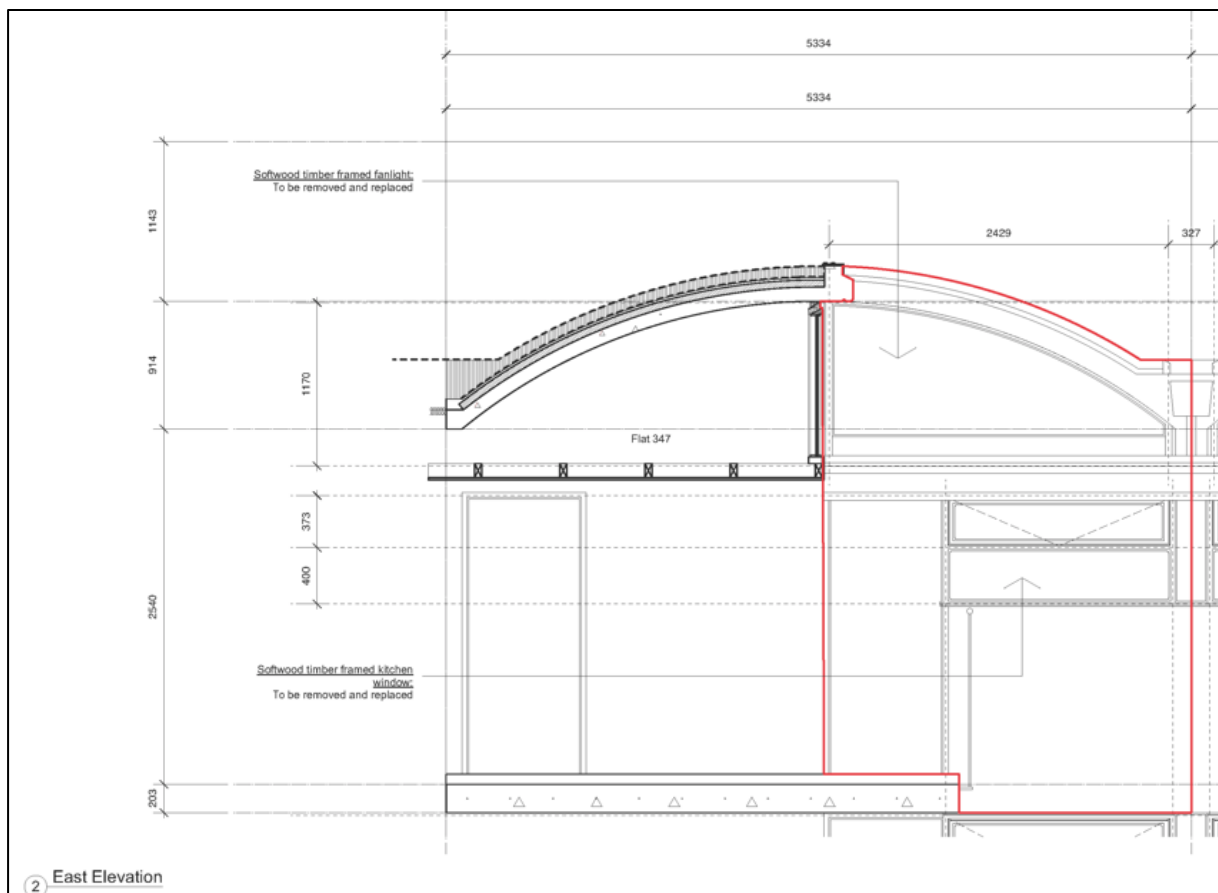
Measured drawing of windows on east elevation (Studio Partington, 2022)
